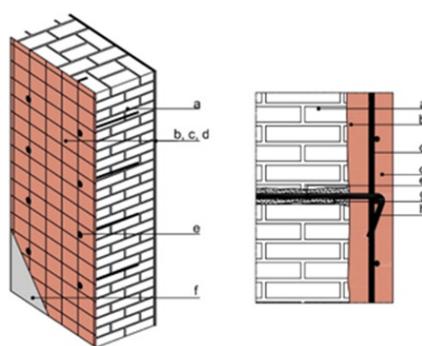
A schematic diagram of a retrofitted URM wall with RC jacketing (Legend: (a) existing masonry wall; (b) first layer of concrete; (c) steel wire mesh; (d) second layer of concrete; (e) steel anchors; (g) a grouted hole; (f) cement-based plaster; and (h) a steel anchor with a 90-degree hook).
